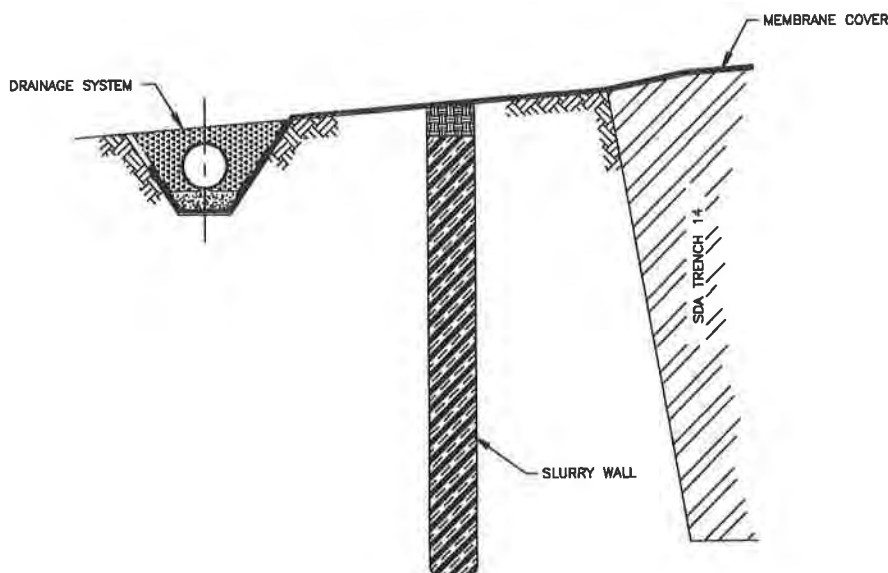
Cross Section Slurry Wall, Geomembrane Cover, and Drainage Collection/Anchor Trench
